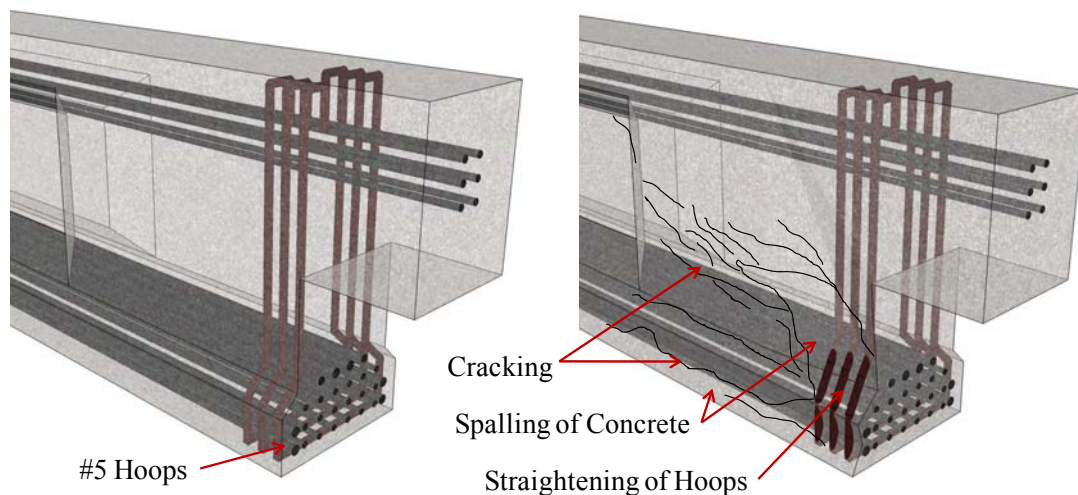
Reinforcement Layout for STM (Mader 1990)
